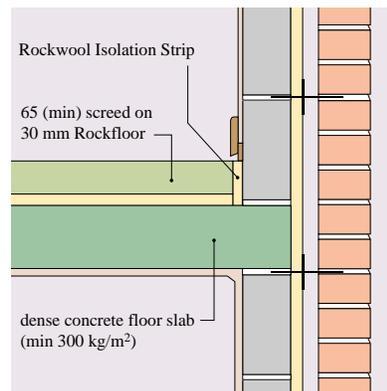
Dense concrete floor using Rockwool Rockfloor under screed
